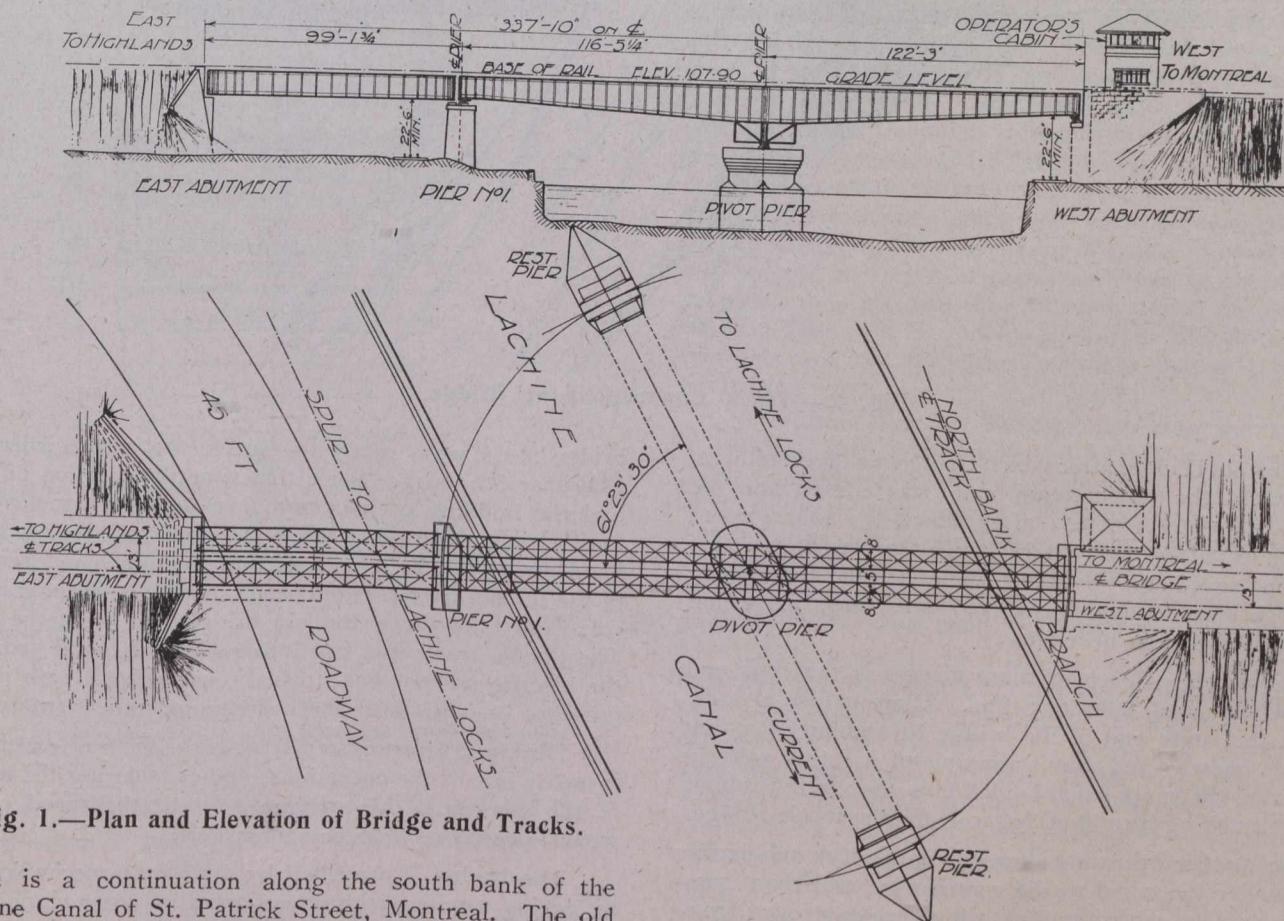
Plan and Elevation of Bridge and Tracks.
